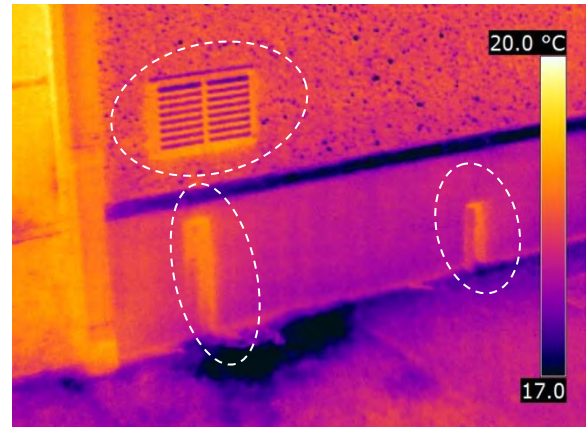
Thermogram of exterior wall to pavement junction indicating EWI at plinth level that has been cut around service pipes entering the dwelling and external vent
